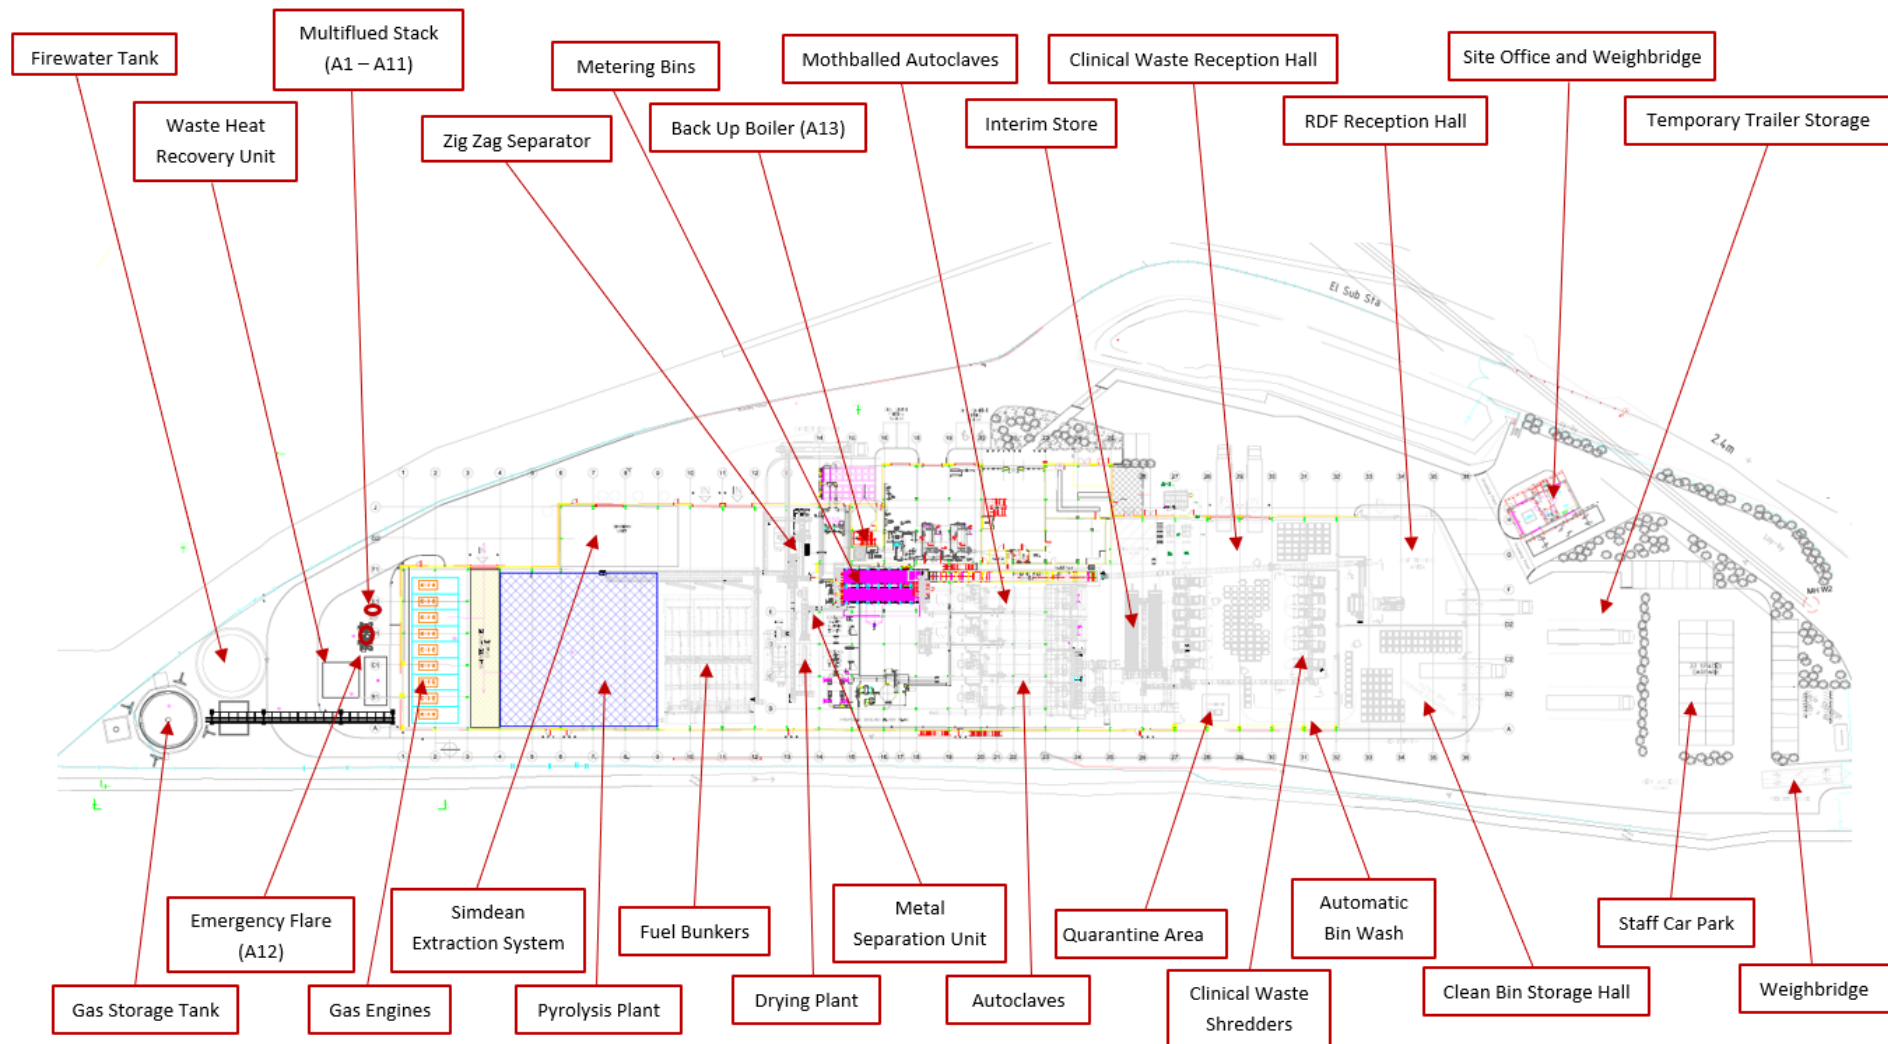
Site layout of the installation indicating the location of the key plant, equipment and process areas.
